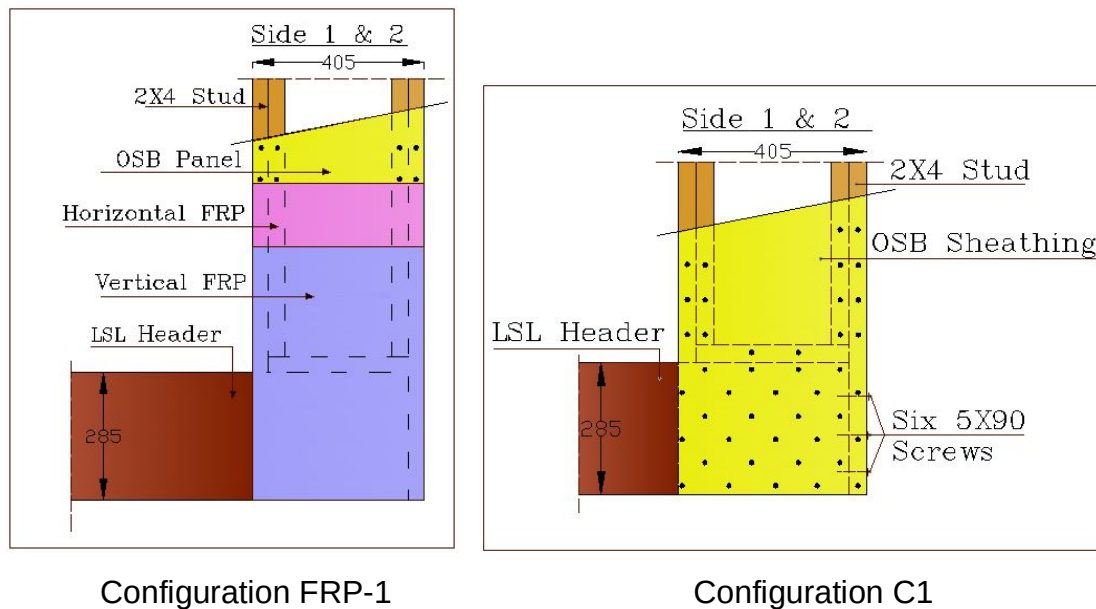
Test configurations of corner joints (dimensions are in mm)
